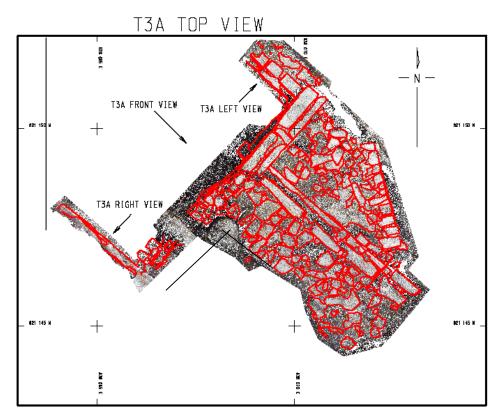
Photographic Survey Image of Pavilion for Greeting Officials and Landing End of Longjin Bridge
